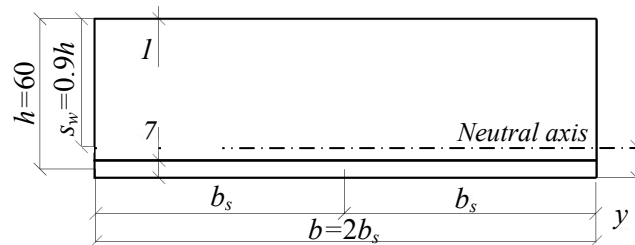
Box-shape profile with thick lower flange and width $b=2b_s$.
